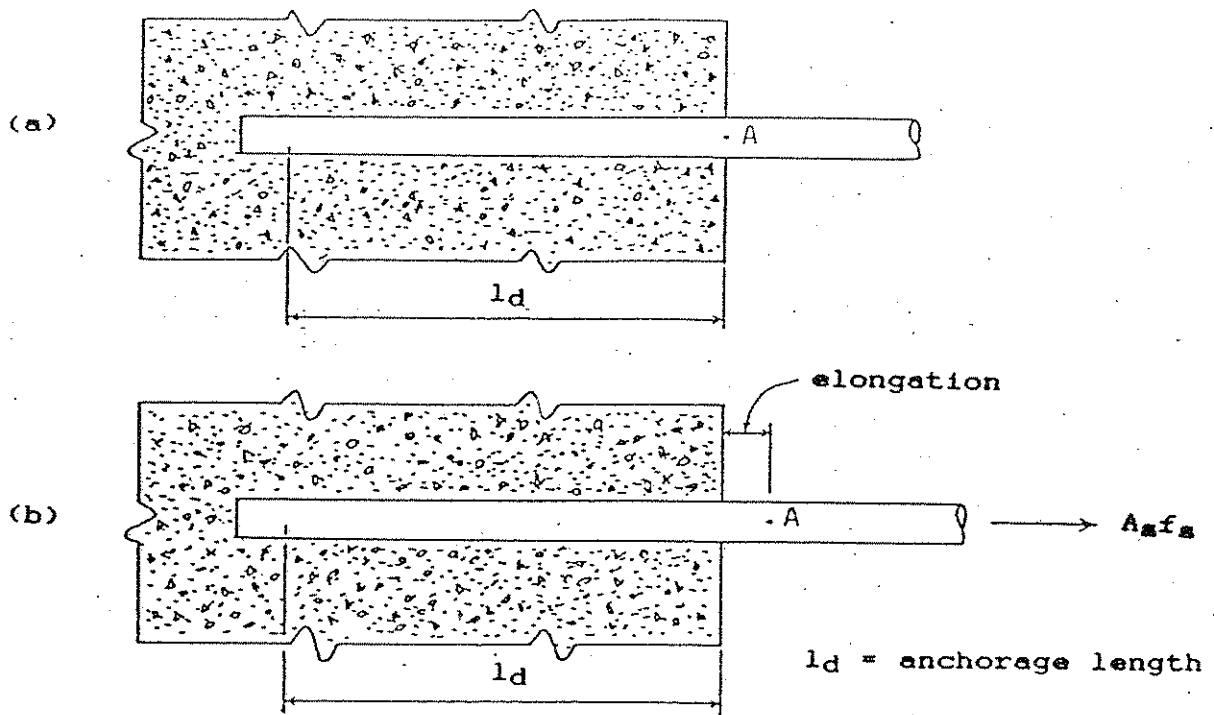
Elongation of a Steel Bar Embedded in Concrete
